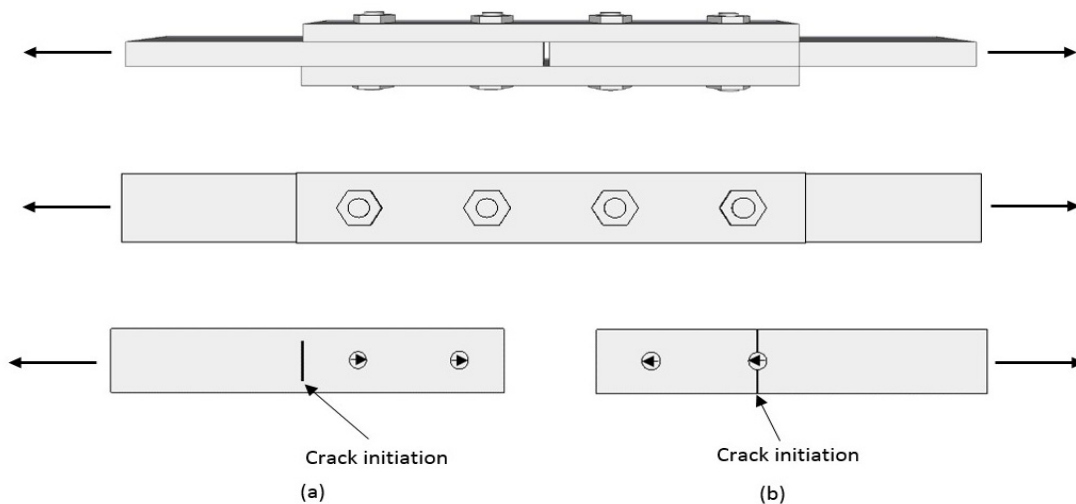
Basic failure modes (a) gross section failure and (b) net section failure.
